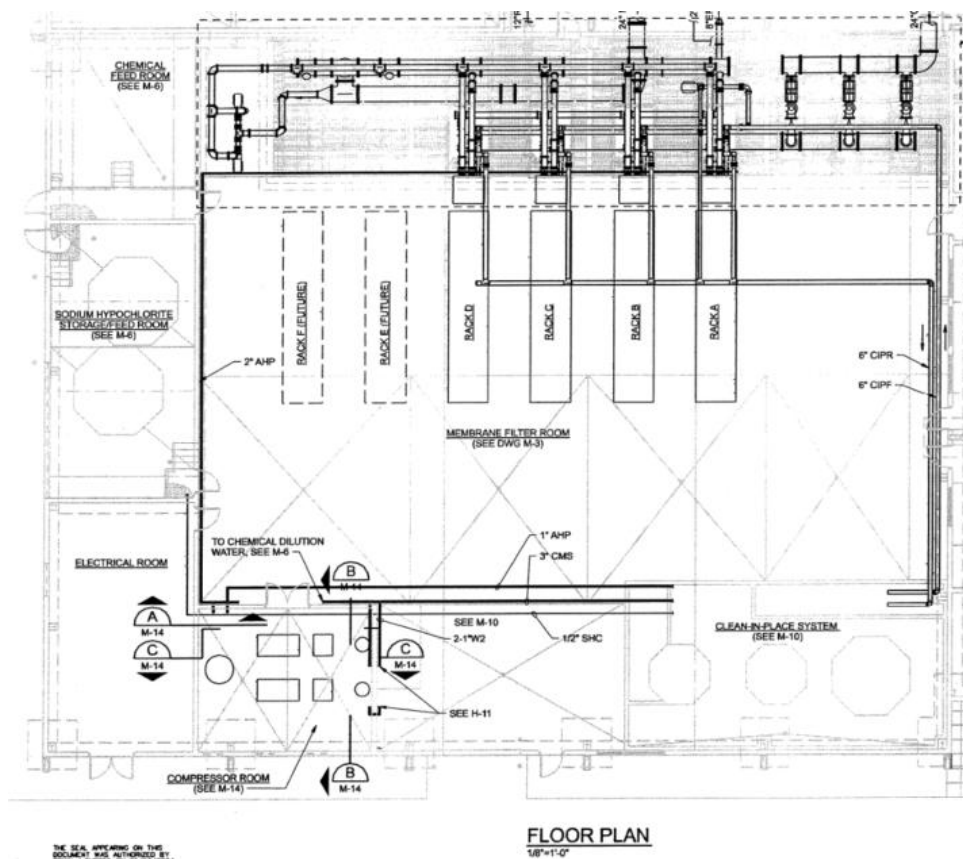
Process Building Overall Floor Plan (CH2MHILL)
